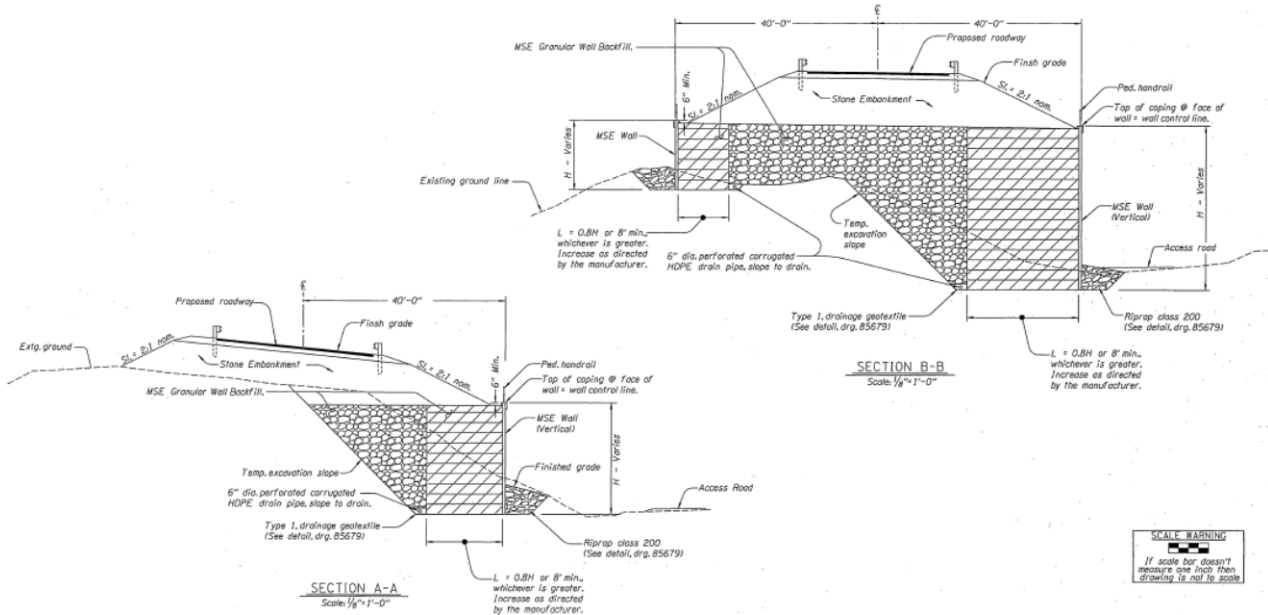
Diagram. Two MSE wall section views for bridge 21252.
